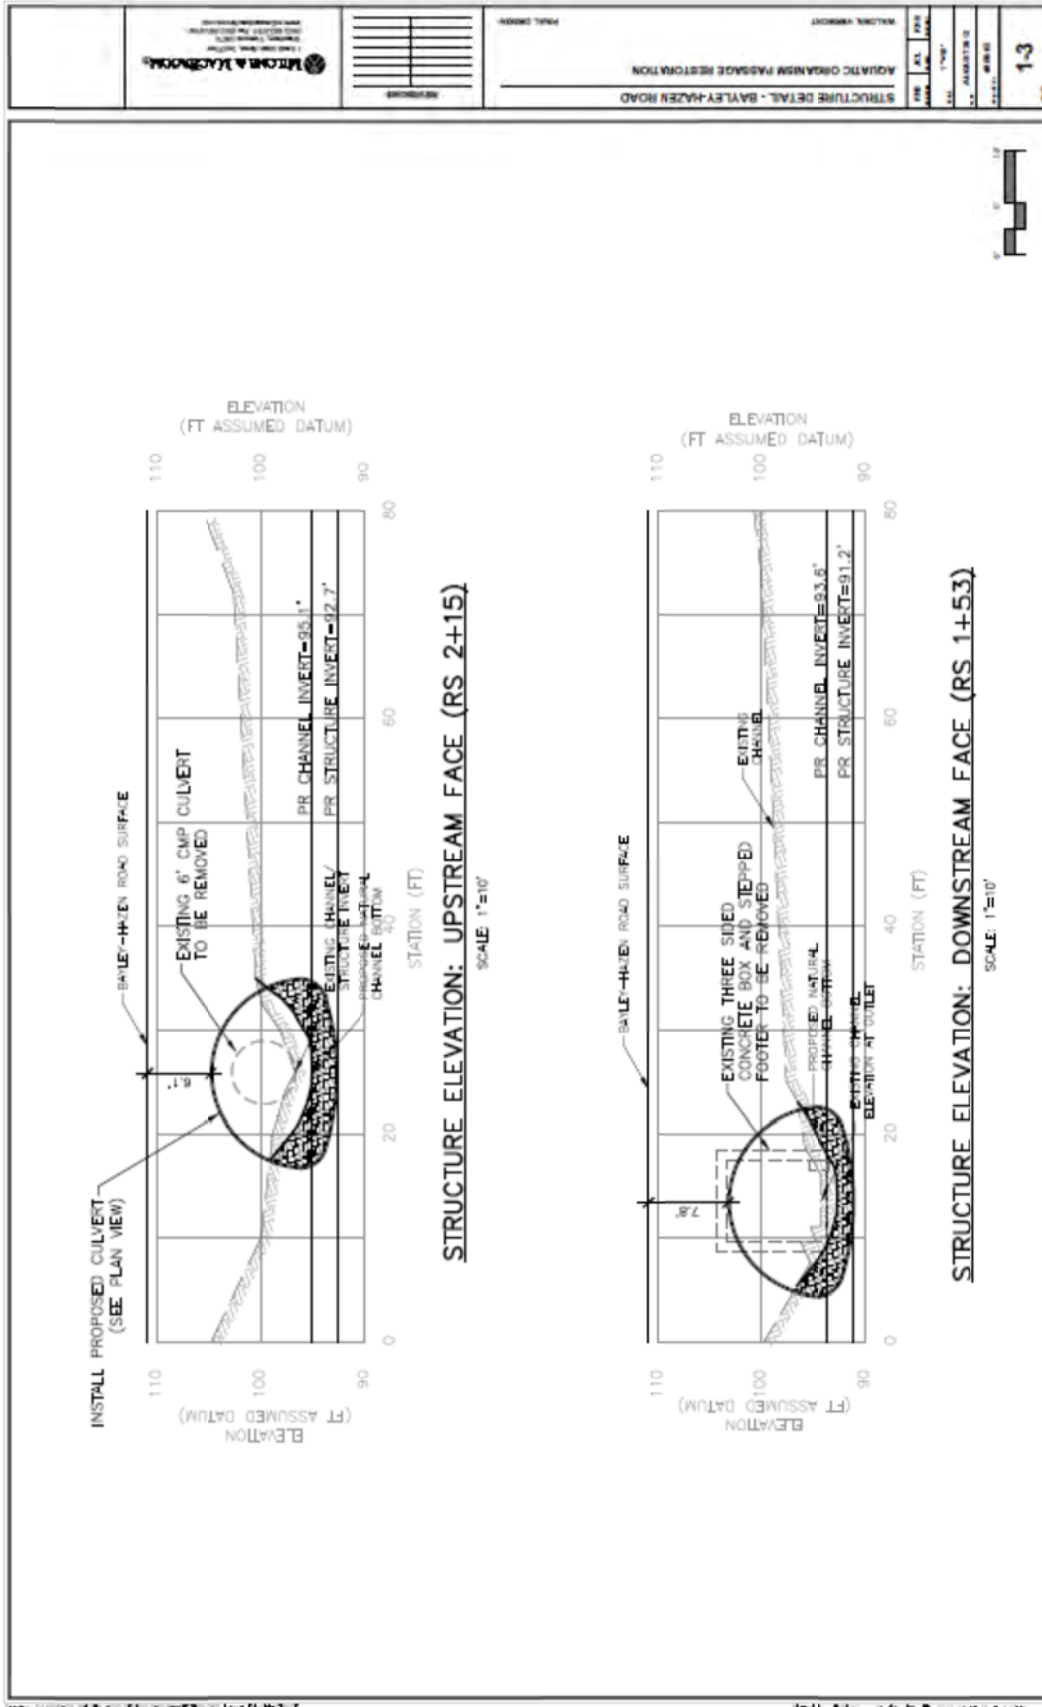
Culvert cross section. (Source: Milone & MacBroom, Inc., 2013)
